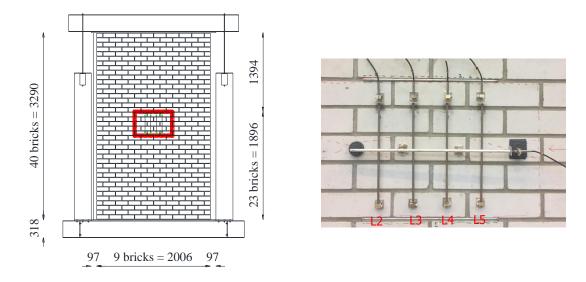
Test set-up for double flatjack test at location 02. The dimensions are in mm.
